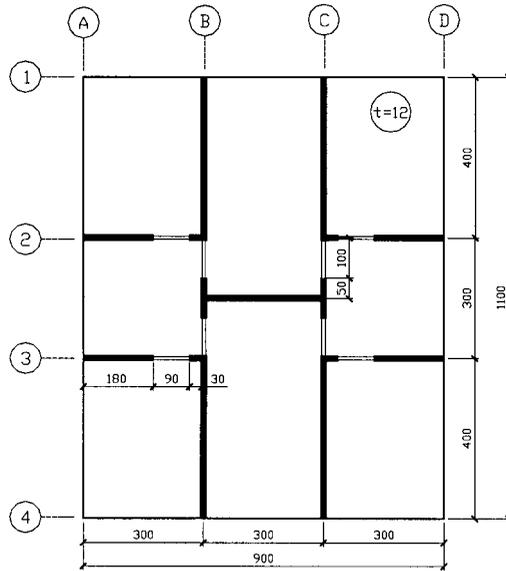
Typical plan view for a square case (Plan No. 11) (units are in cm).
